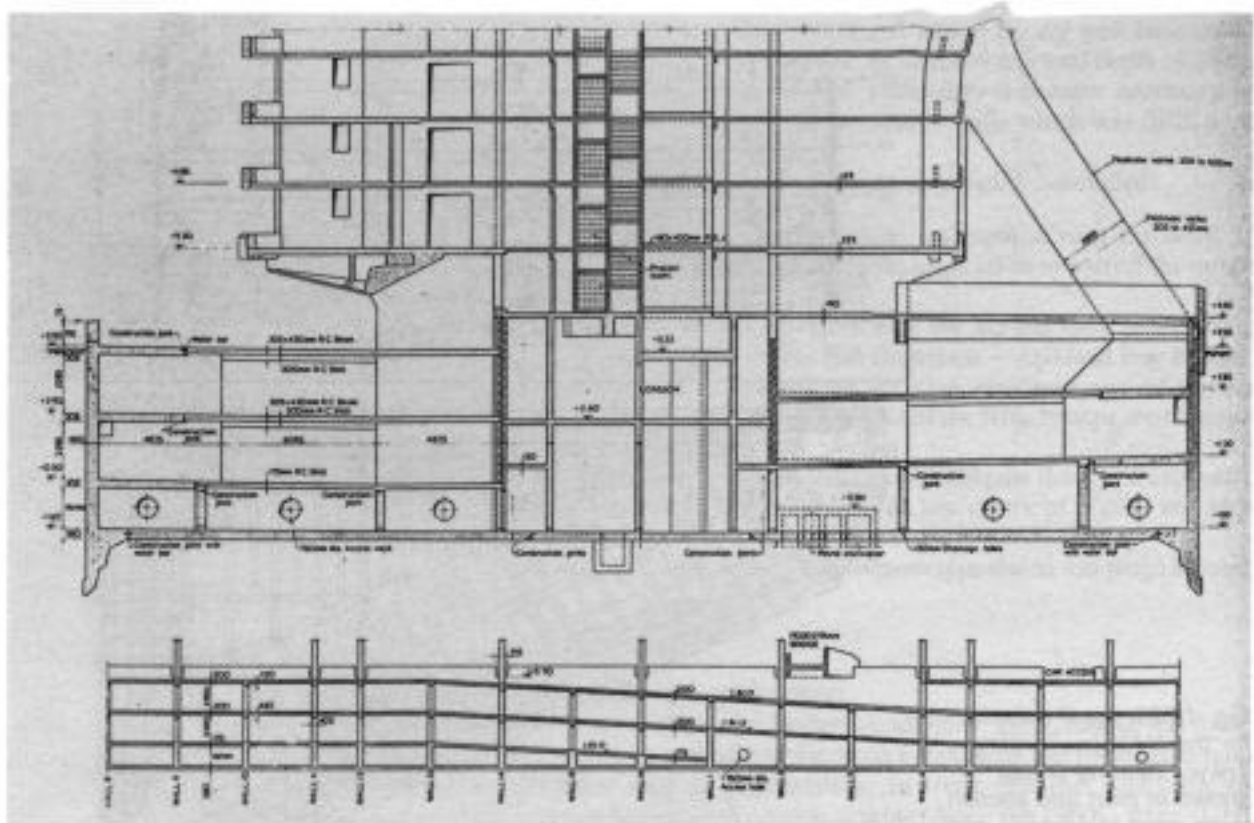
Wickham caisson: cross-section and plan (Nisbet²⁸)
